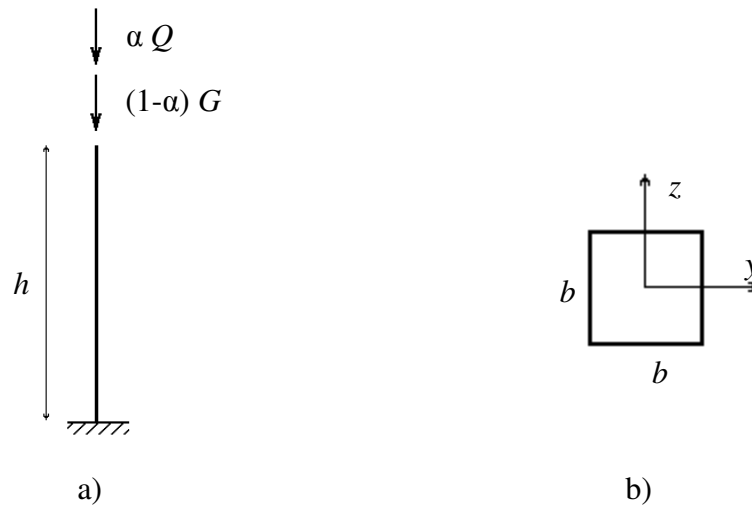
Bottom clamped column: a) structural model; b) cross section.
